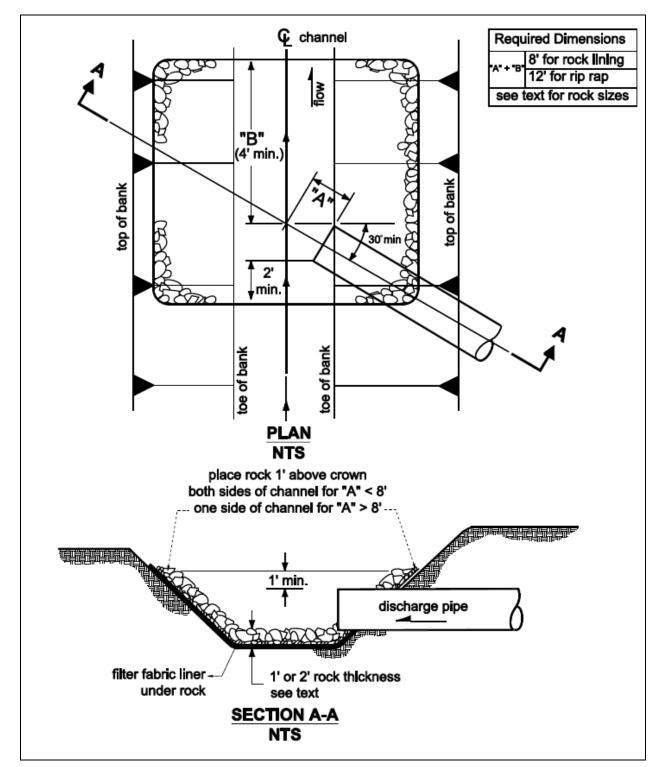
Pipe/Culvert Outlet Rock Protection
